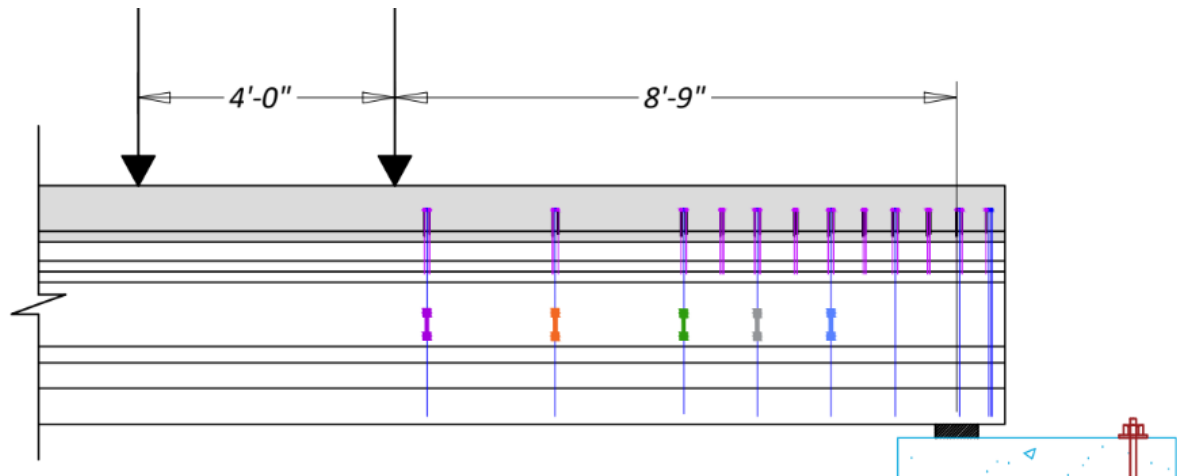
Tx34-1 Shear Test 2: Shear Span of Reinforced End at Failure.
